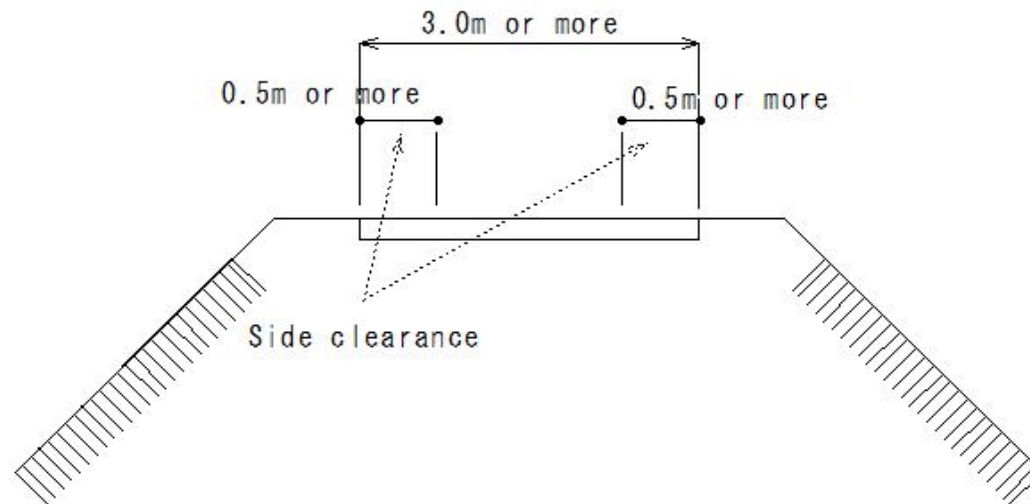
Width and construction limits of bicycle-only roads, etc.
